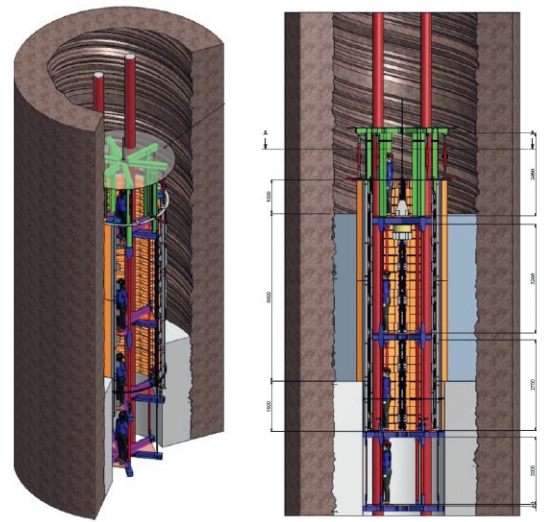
Variant 3 – pump pipe constructed using climbing formwork. Bild 7. Variante 3 – Herstellung einer Pumpenröhre mit Einsatz einer Kletterschalung. Source/Quelle: RAG
